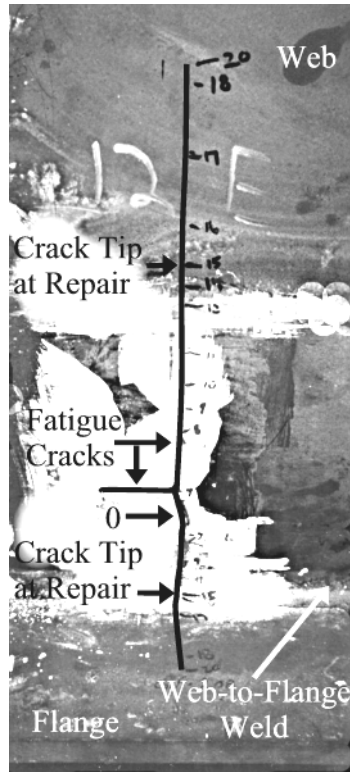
Fatigue Crack on East Face of Joint 12, Specimen 3
